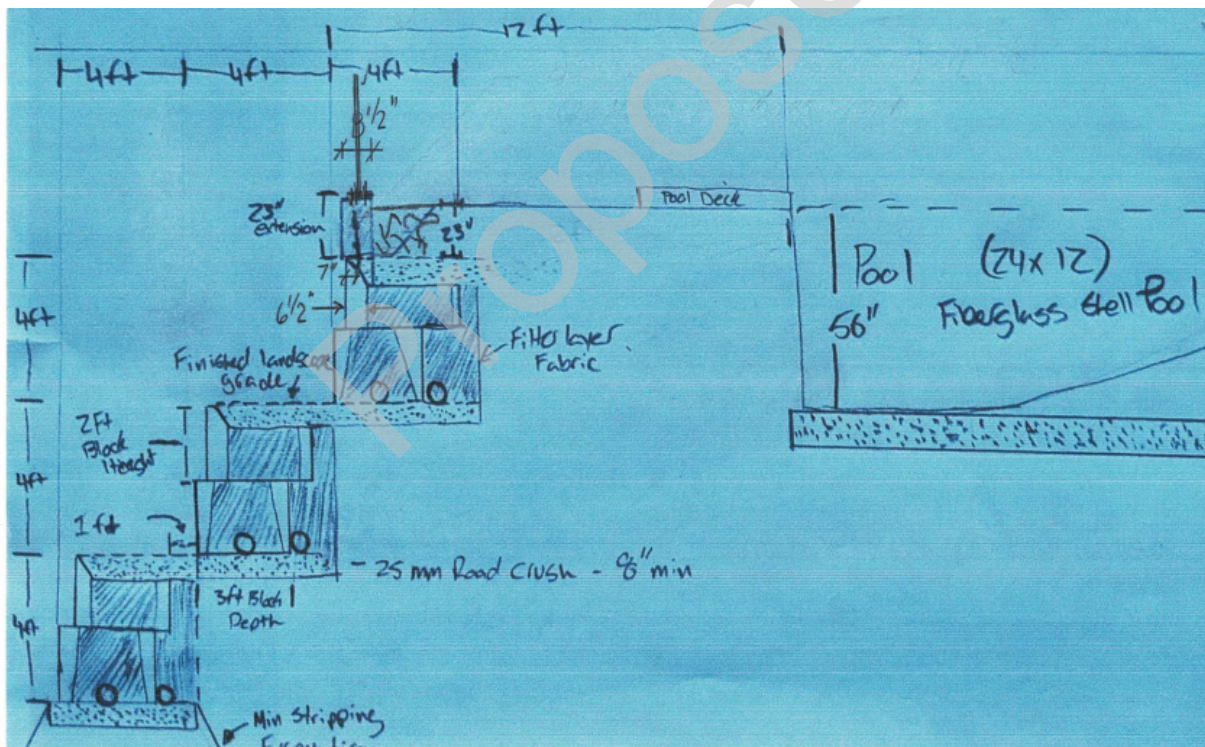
Owner supplied cross section through three tier Verti-block retaining wall
